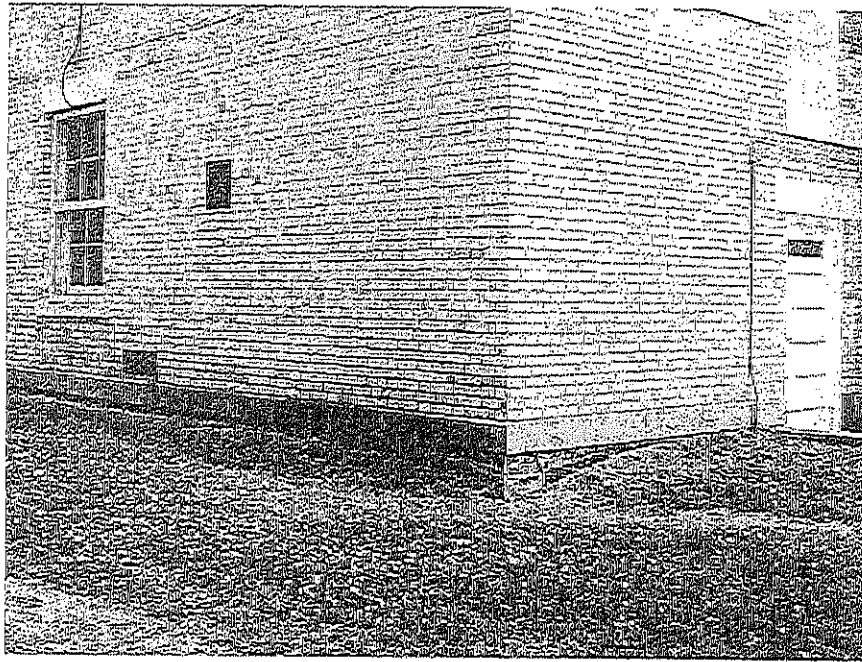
Water overflowing the displaced gutter in the northwest corner has caused severe soil erosion that has resulted in the grade pitching back towards the building. Backsplash from the ground has also stained masonry surfaces and damaged mortar joints. Note the expedient but unsightly surface run conduit emerging from the window head on the left and around the door on the right.
